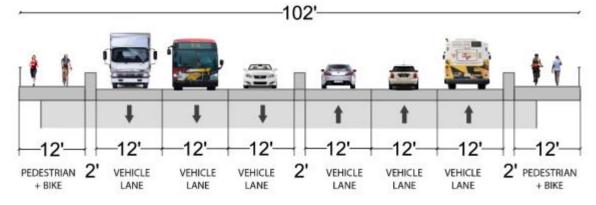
NEW SIX-LANE BRIDGE AND DEMOLITION OF EXISTING BRIDGE
